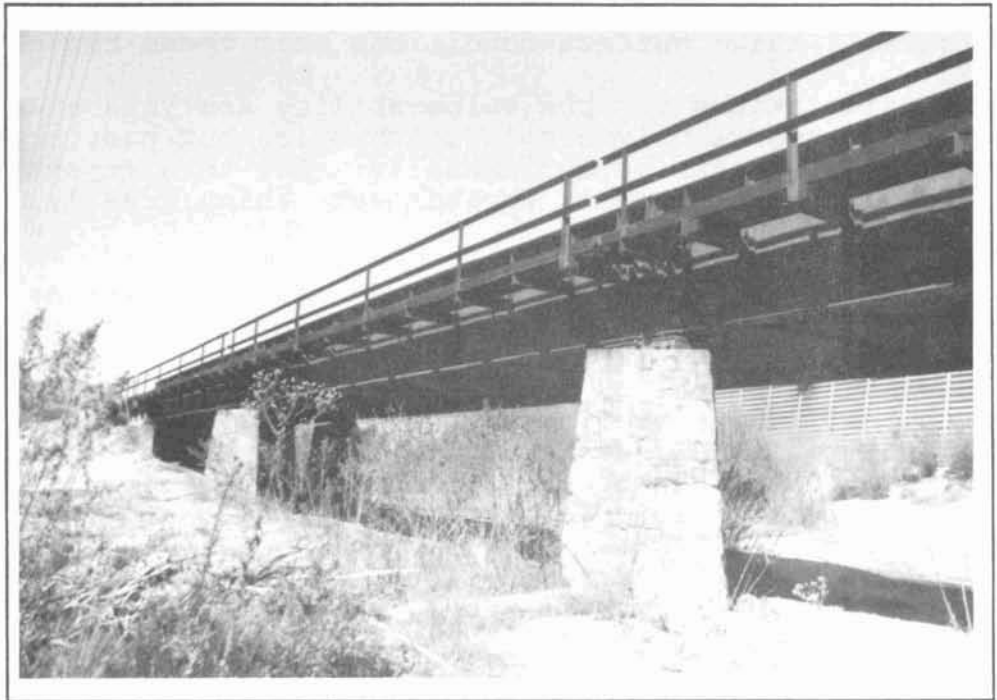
Santa Fe Railroad Rubble Masonry Pier Bridge
